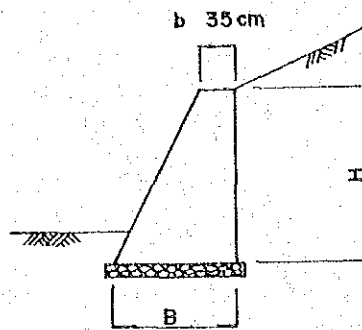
GRAVITY TYPE RETAINING WALL
